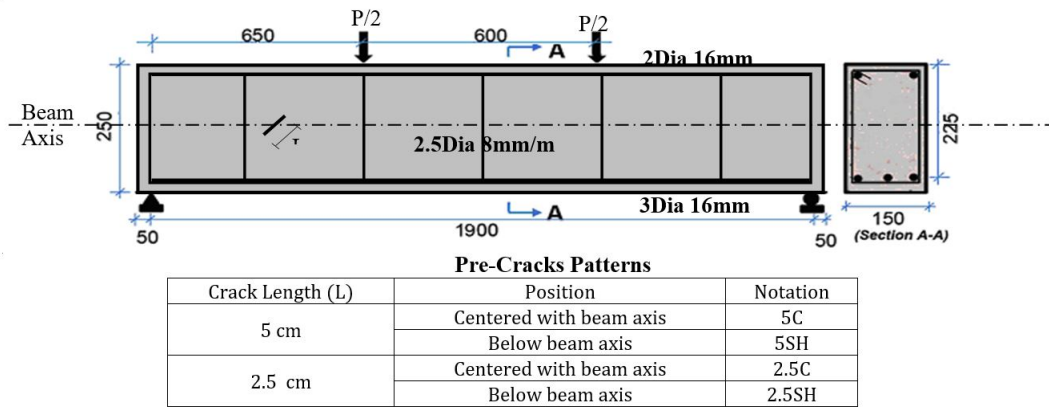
Dimensions, Positions and patterns of Pre-Cracks, and reinforcement detailing
